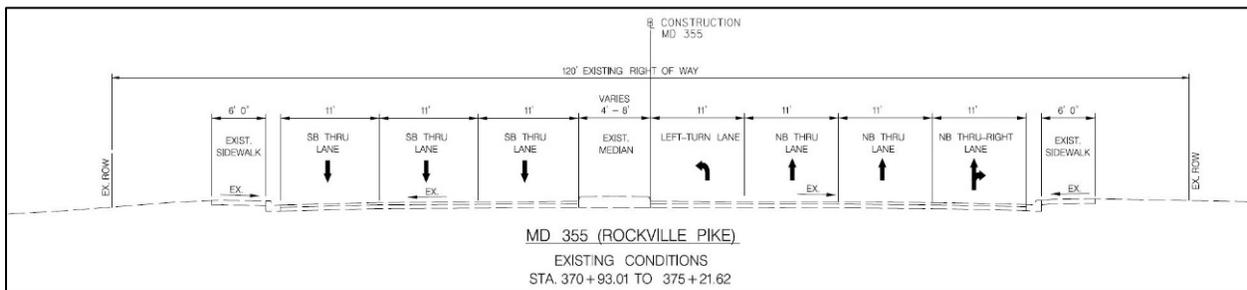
Existing Typical Cross Section – Rockville Pike south of Old Georgetown Road
